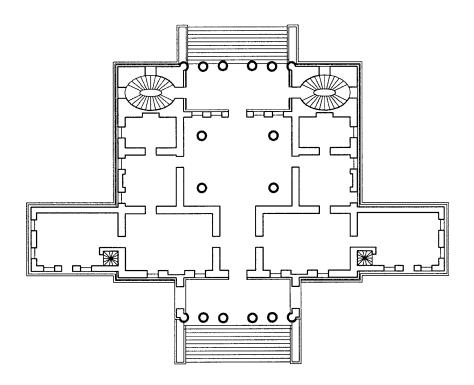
Villa Cornaro: Piano noble floor plan
